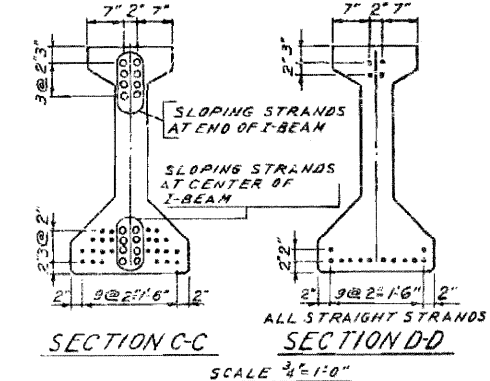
DETAILS OF PRESTRESSING STEEL FOR 57'9" SPANS I-BEAMS
